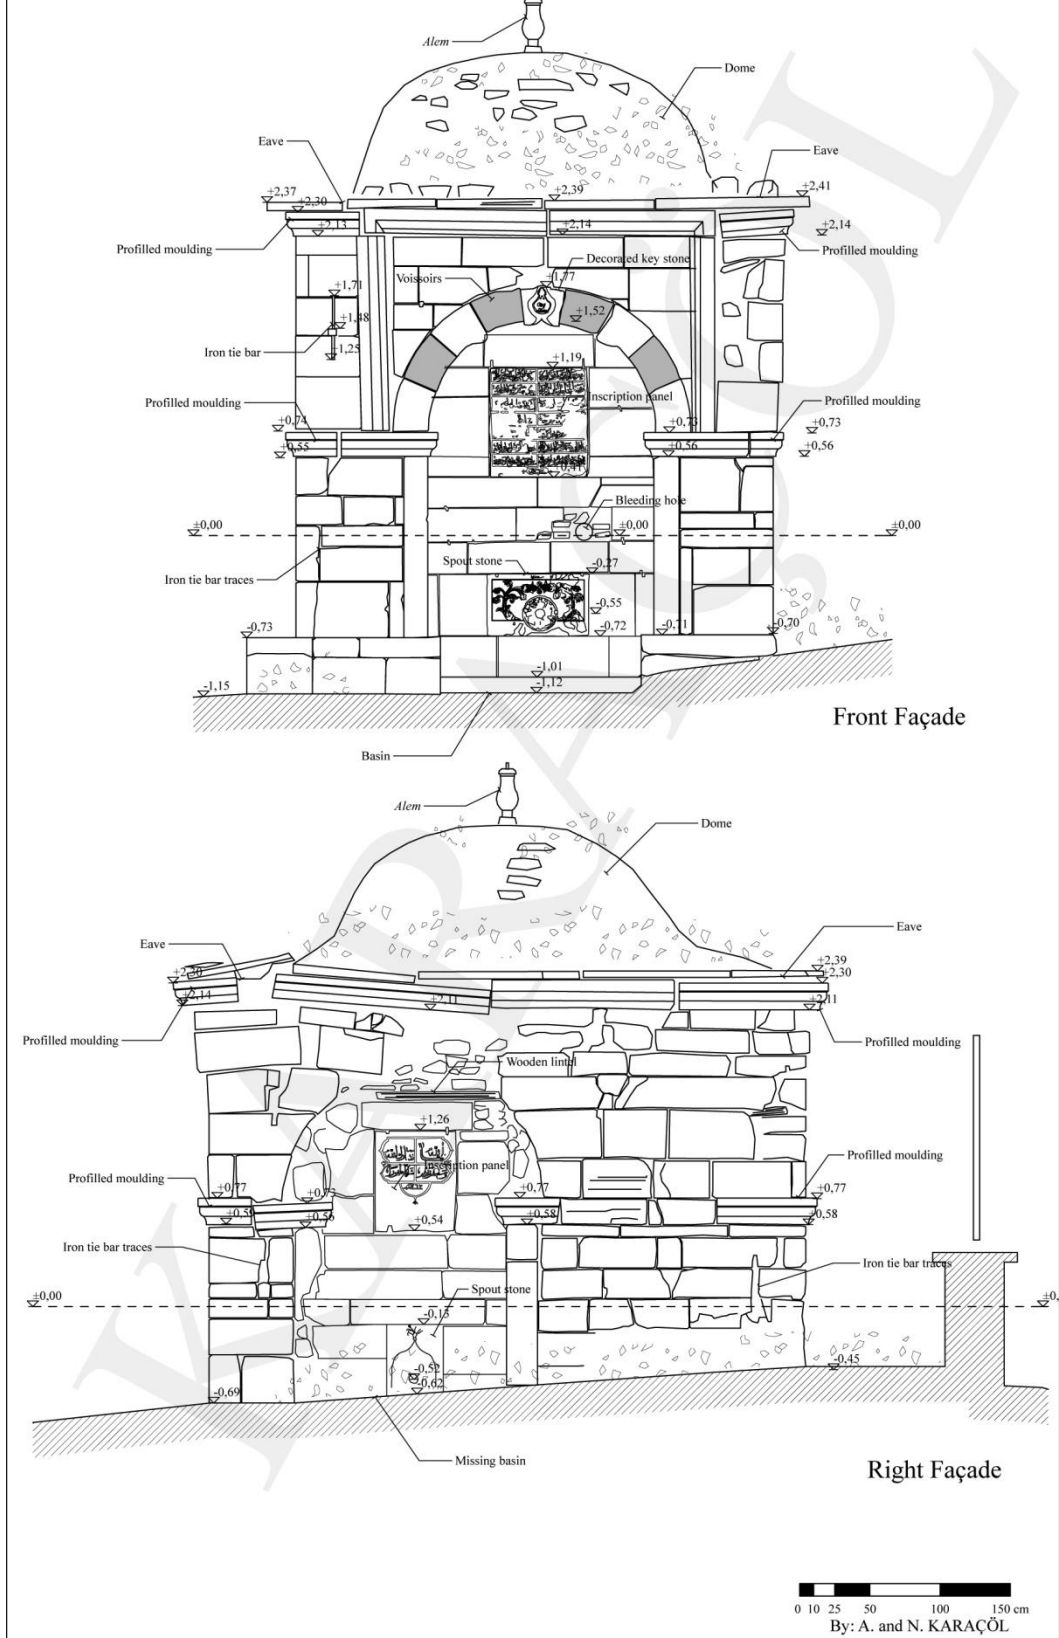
18. Hamaloğlu Fountain front and right façade drawings
